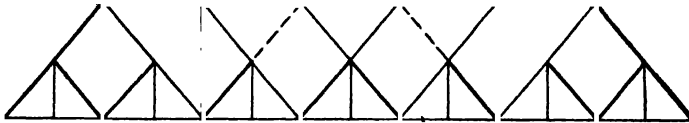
Petit Truss with Sub-struts and Parallel Chords (Baltimore Truss).
